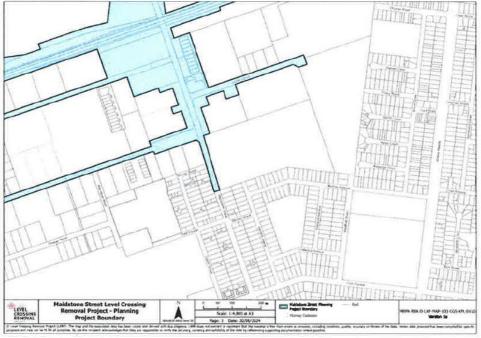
Project Boundary Plan as part of public consultation under Clause 52.03
